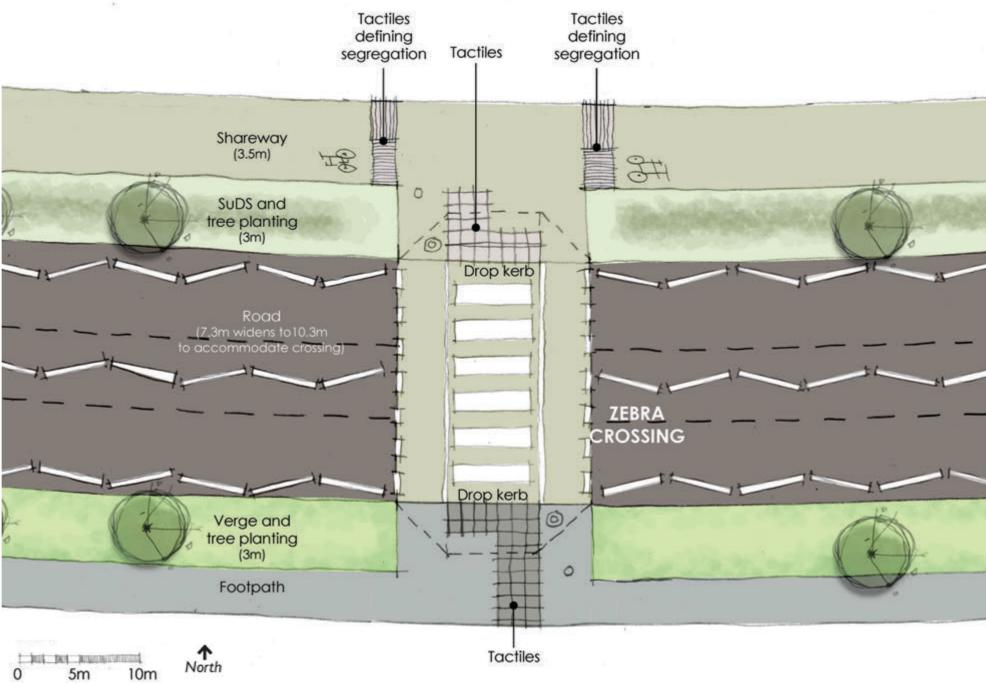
Strategic Route Design Study - Zebra Crossing Typical Layout
